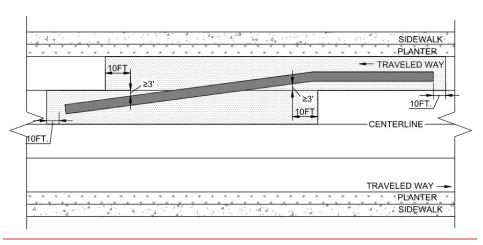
5 Overlay Limits for Pavement Cuts that Cross from One -Lane to Another
